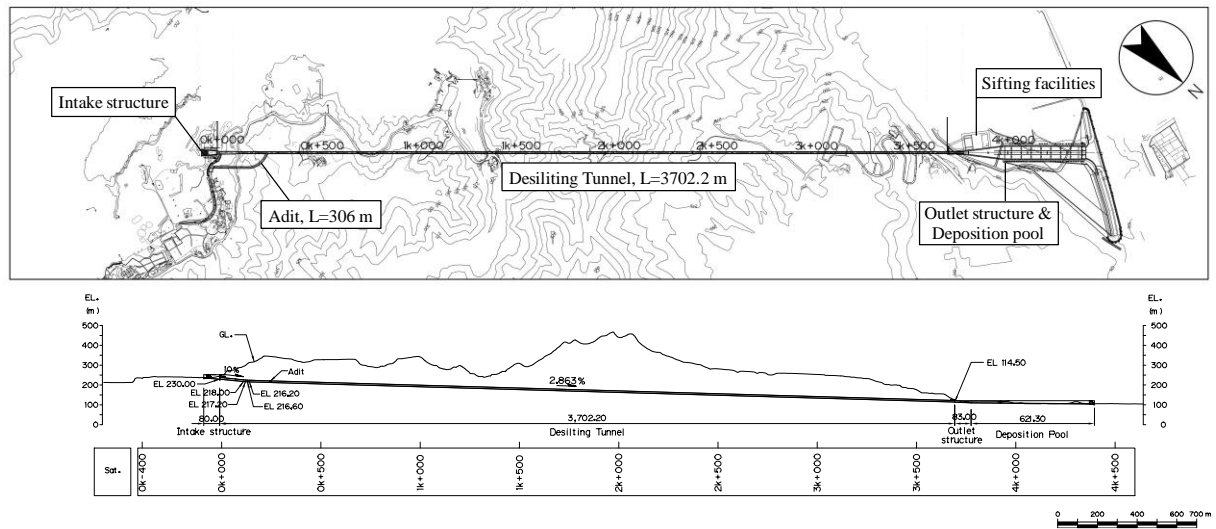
Plan view and profile of the desilting tunnel at Shihmen Reservoir
